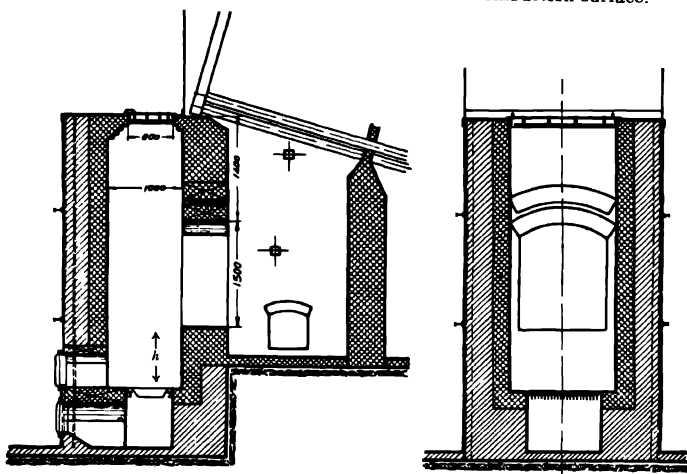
Firewood shaft furnace with vertical combustion surface.
